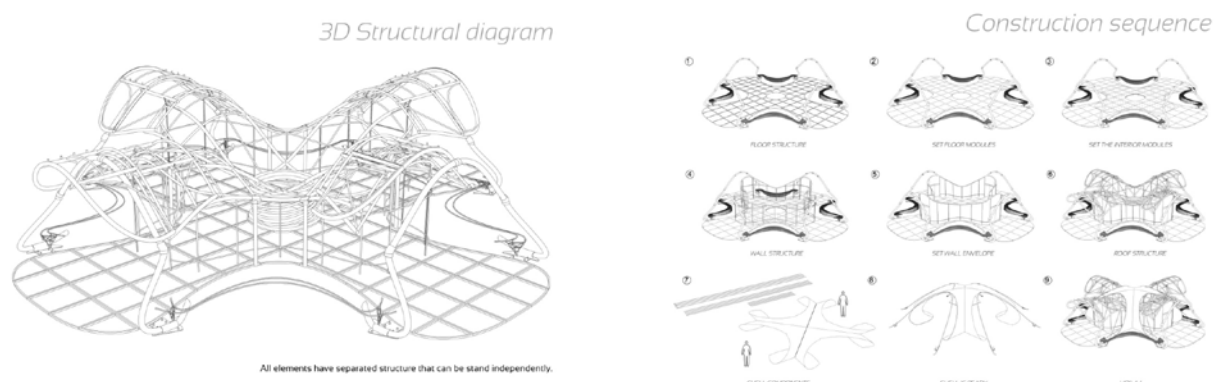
The structural elements of a travelling pavilion, 2015 [credit: Raymond Leonhart]
